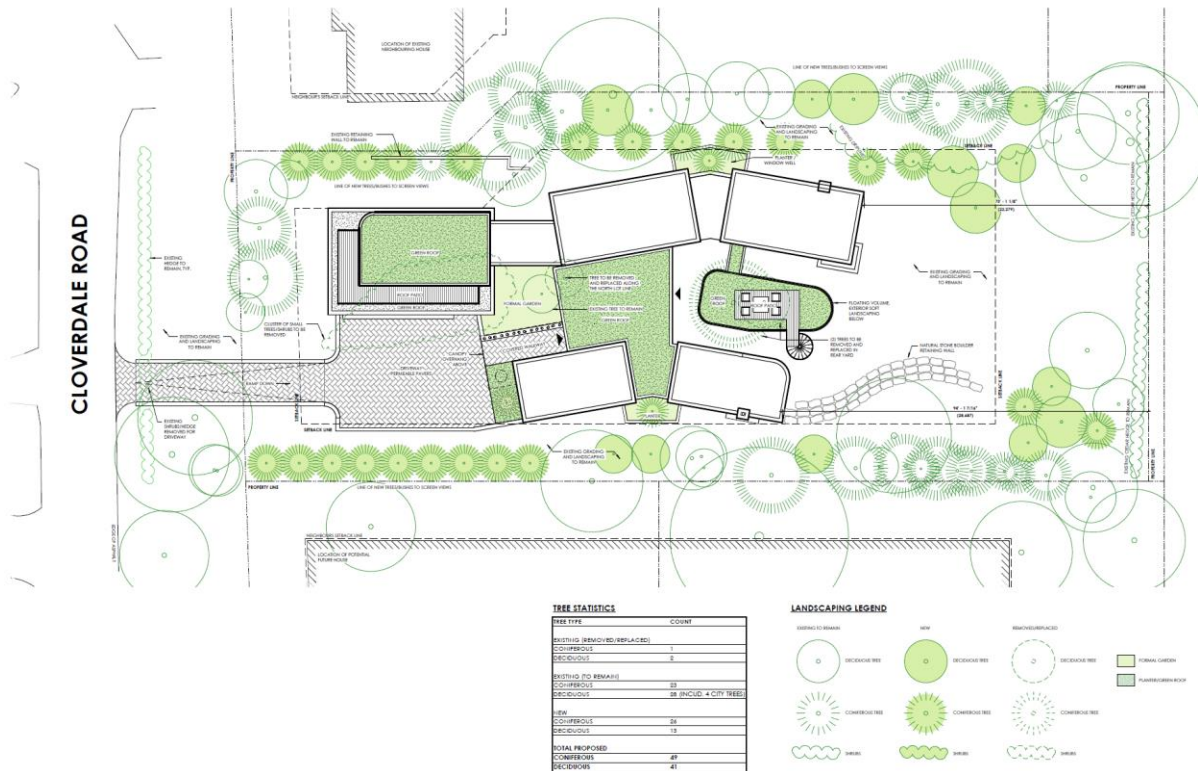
Conceptual landscape plan showing the revised layout. Source: Linebox Studio 2021.
